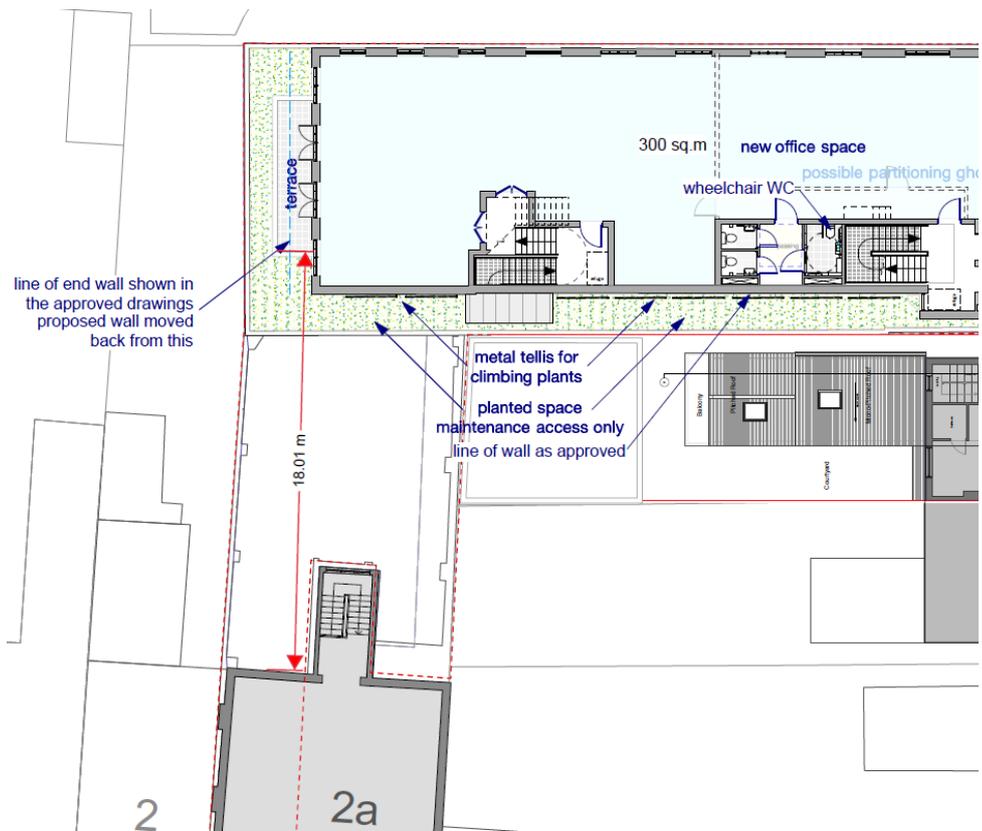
Plan at third floor level showing distance between roof terrace and neighbouring 2a Fairbridge Road is at least 18.0m.
